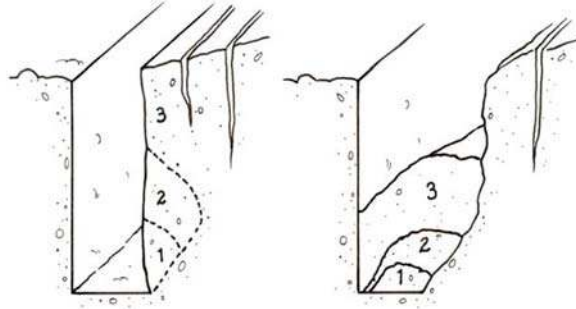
Sequential trench failure (Alberta 2009)
